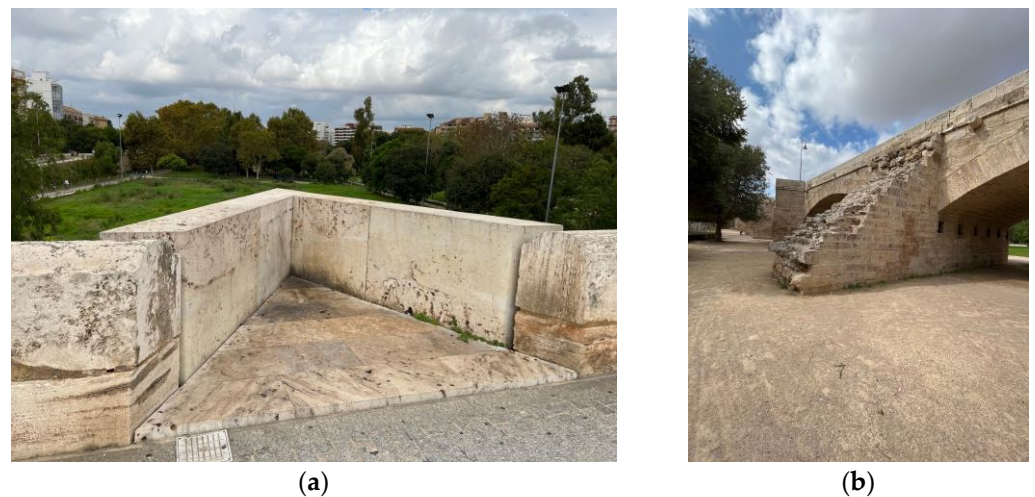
(a) The new replacement sidings on the bridge); (b) the staircase has not regained its use and has remained as a stump.
